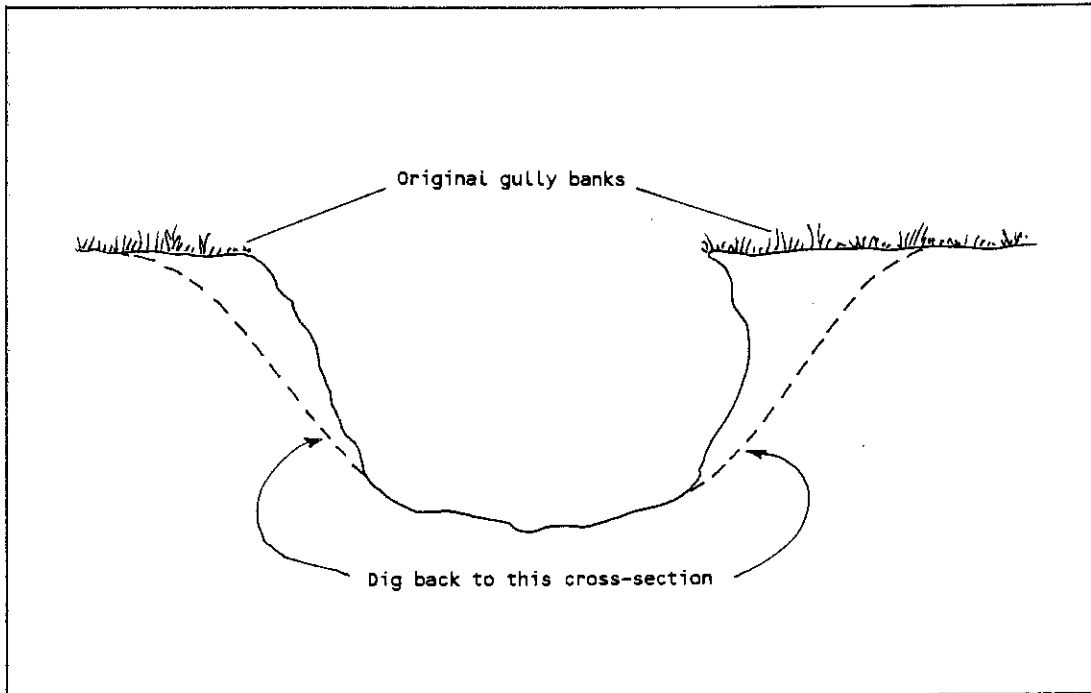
Cross-section of a gully showing how banks should be sloped back prior to constructing a double-row post-brush dam (redrawn from Gray & Leiser 1982).
